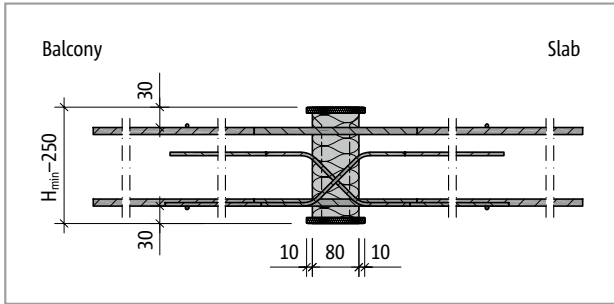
Schöck Isokorb® T type D with CV30: Product section
